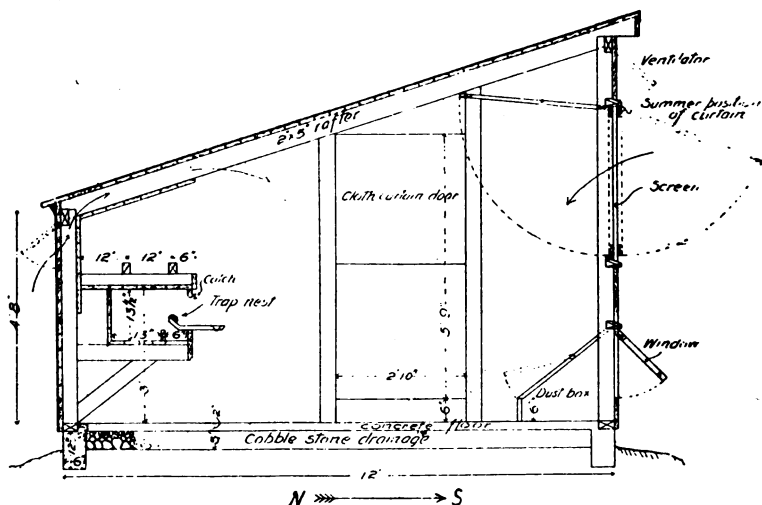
End view of House, 12 ft. sections as designed by Cornell University.
